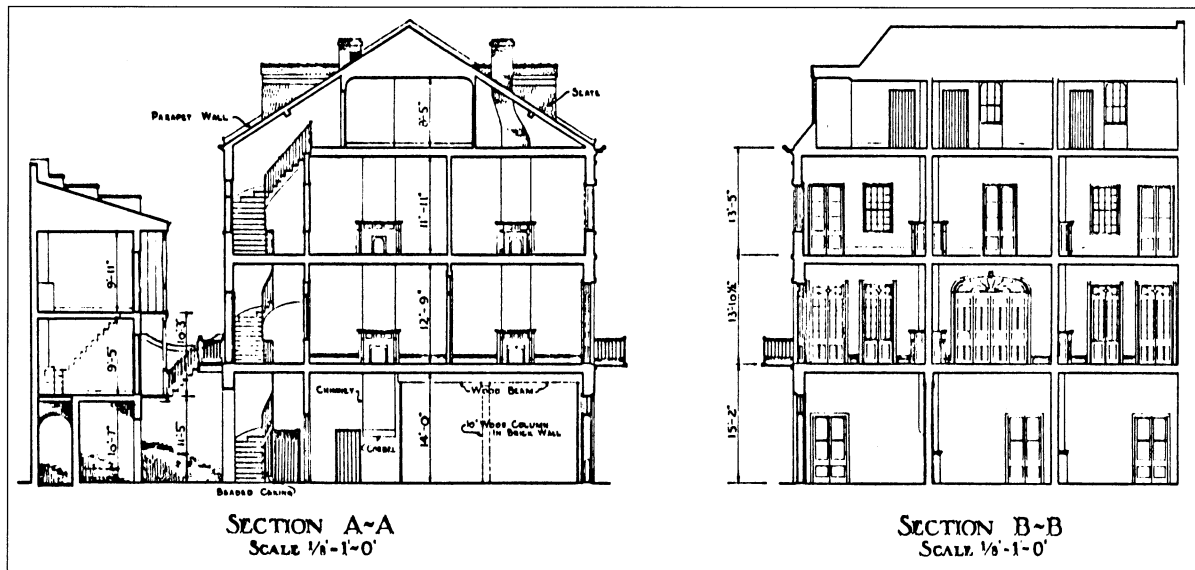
Sectional View of the Gally House, New Orleans, Louisiana. The slave quarter is on the left with privies located on the first floor, kitchens on the second floor, and slave bedrooms on the third floor. Drawn by E. N. Maddux, 1936. Historic American Buildings Survey, courtesy of the Library of Congress.
